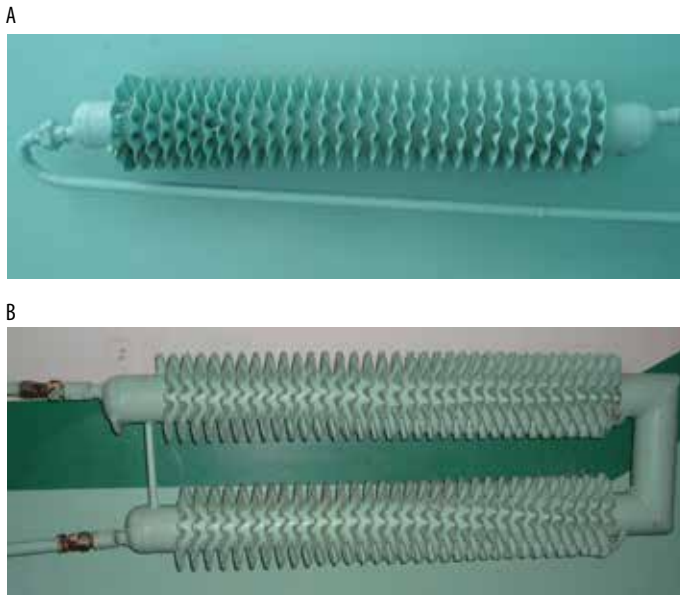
An example of a configuration of finned tube heaters: A) a single-row single radiator, B) a single-row double radiator (Source: T.J. Teleszewski's private archive)
